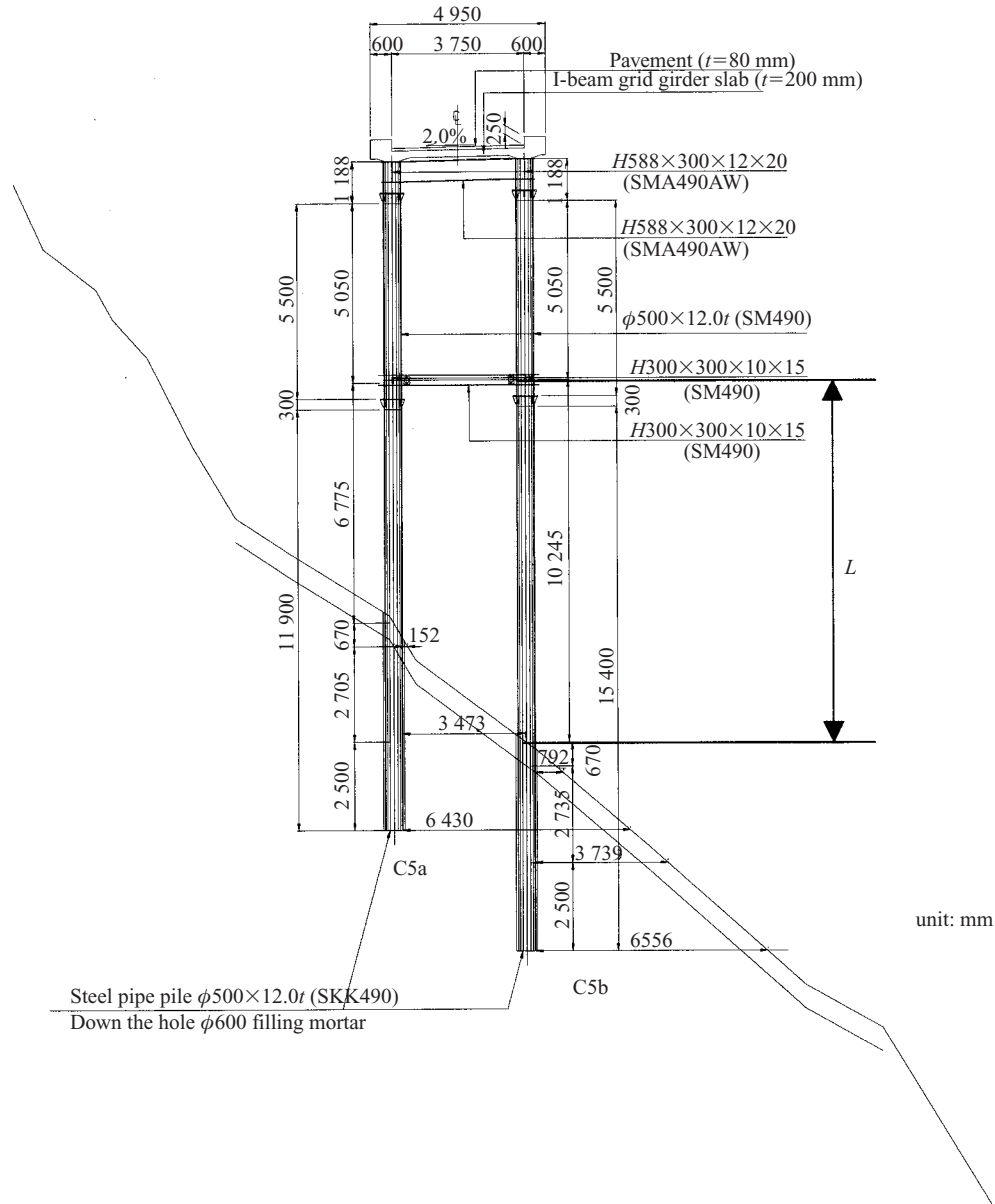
Typical cross-section of Metal-Road at Otaki-Dam (Column No. C5)
